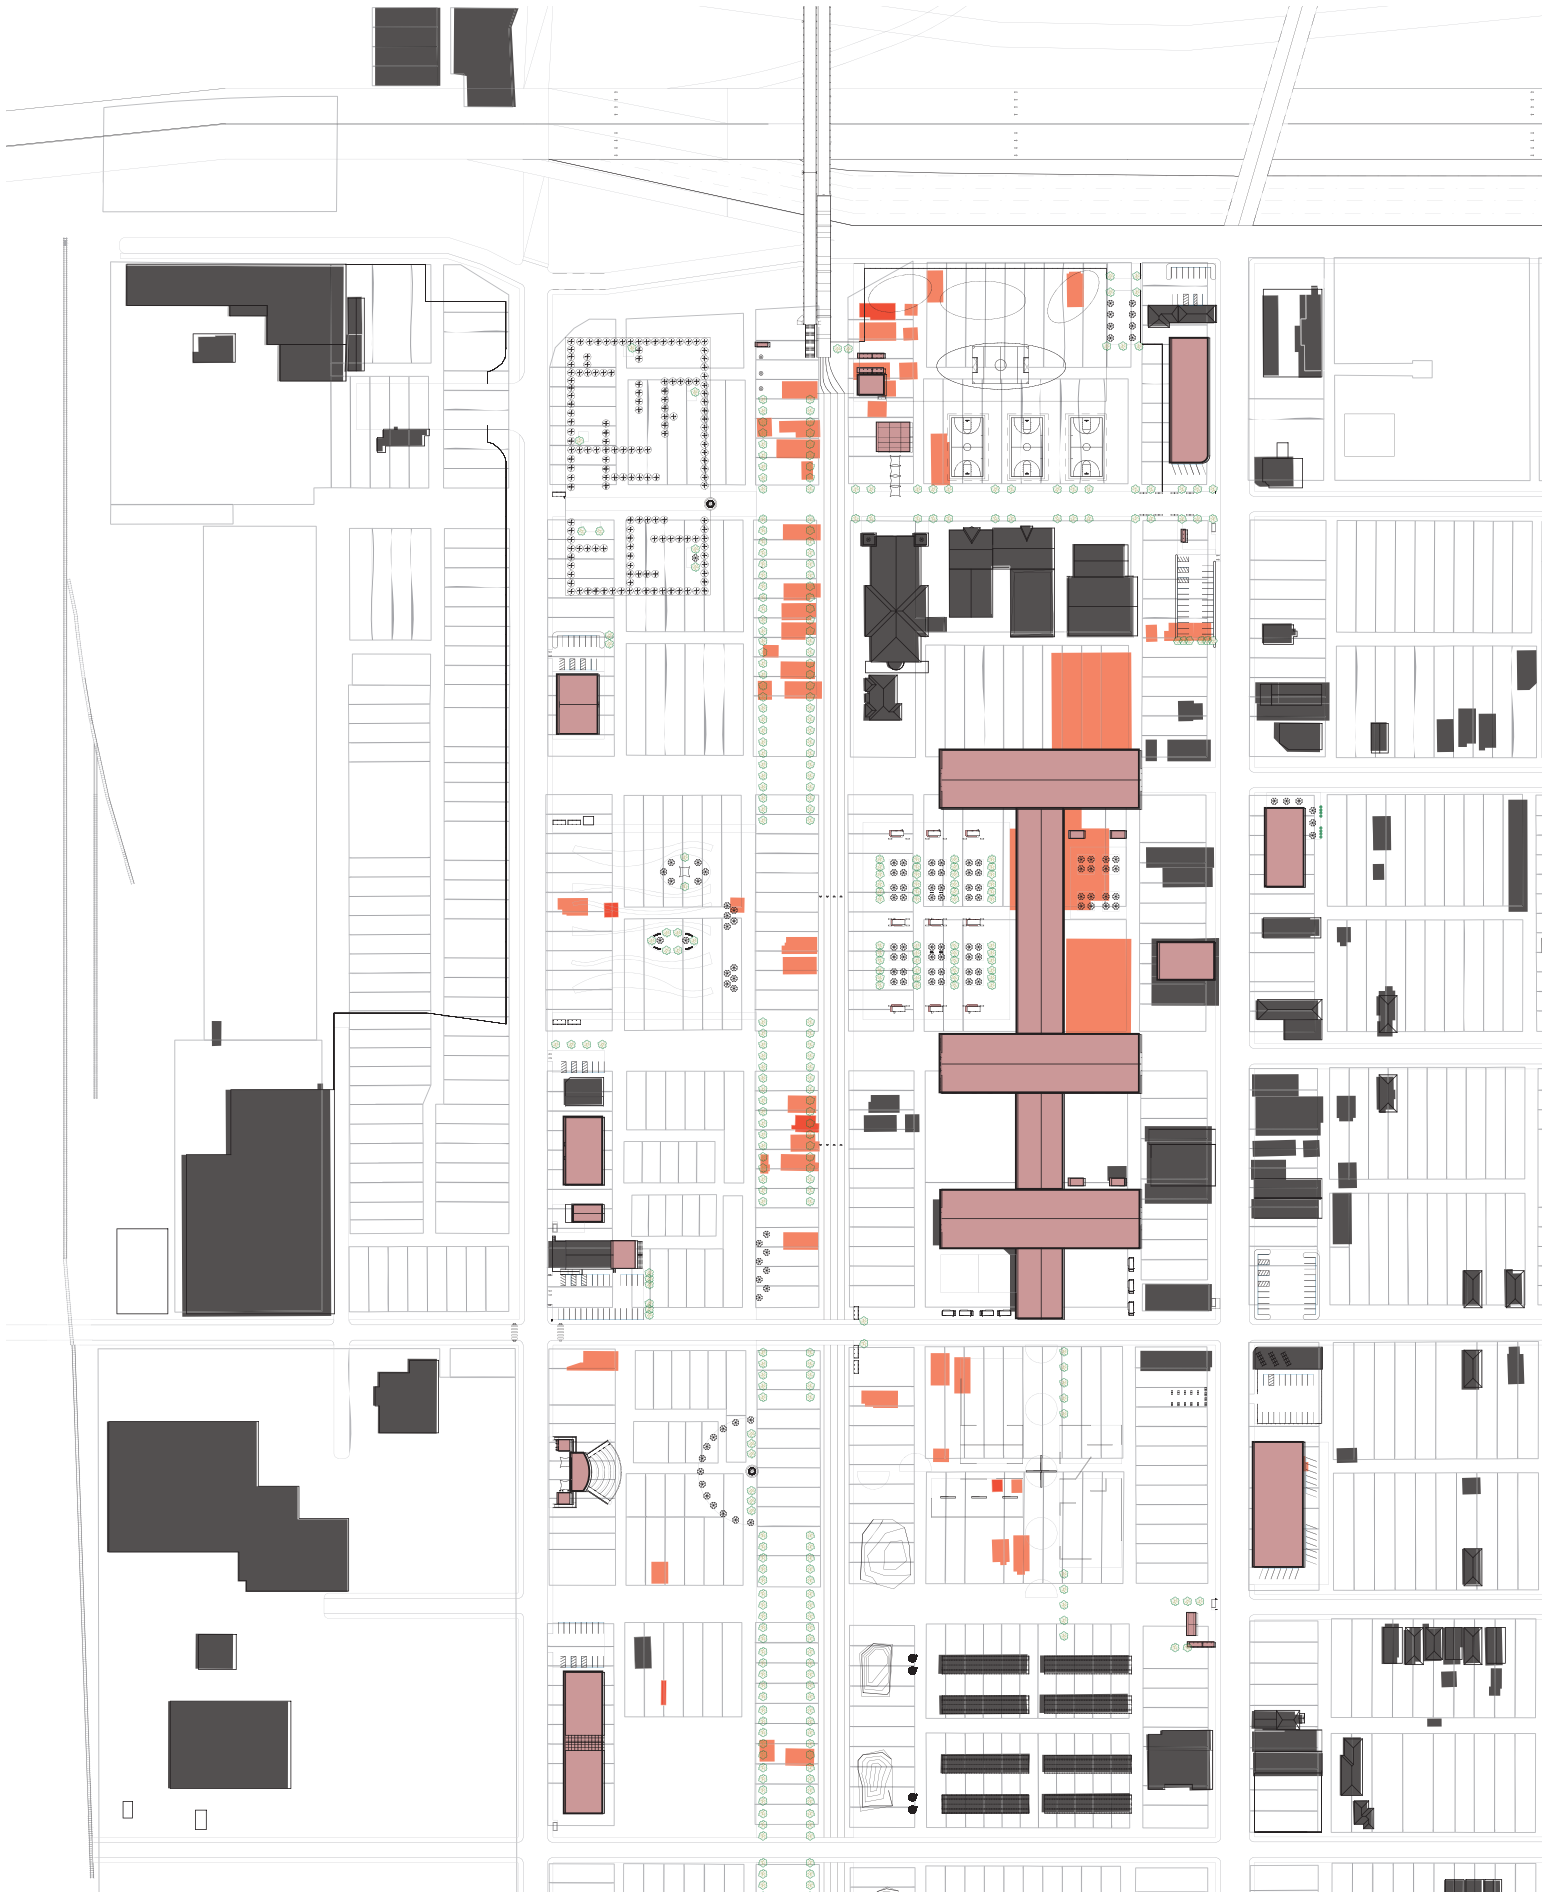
SITE PLAN WITH PARCEL OVERLAY
